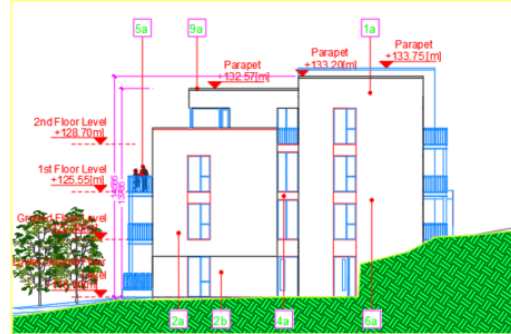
Proposed Section, Side Elevations of Duplex Block E
